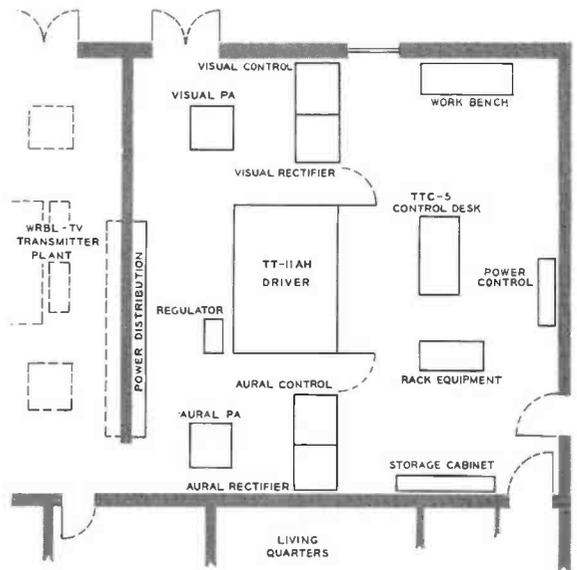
WTVM shares the transmitter building with WRBL-TV. This floor plan illustrates the roomy, well laid-out plant.
